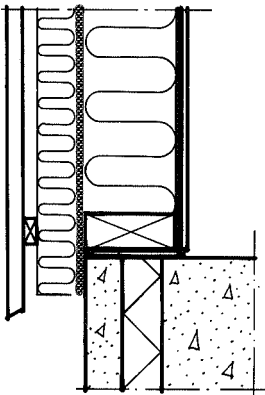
Example of a joint between a wooden wall and a concrete slab. The external insulation extends over the skirting. The wind protection, e.g. asphalt board, is jointed with the skirting sheet using fibre concrete for example.
